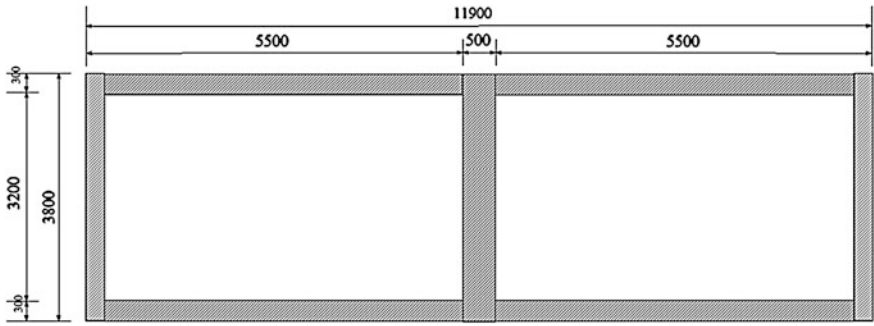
Top view drawing of air shaft outlet of coal mine before reformation
